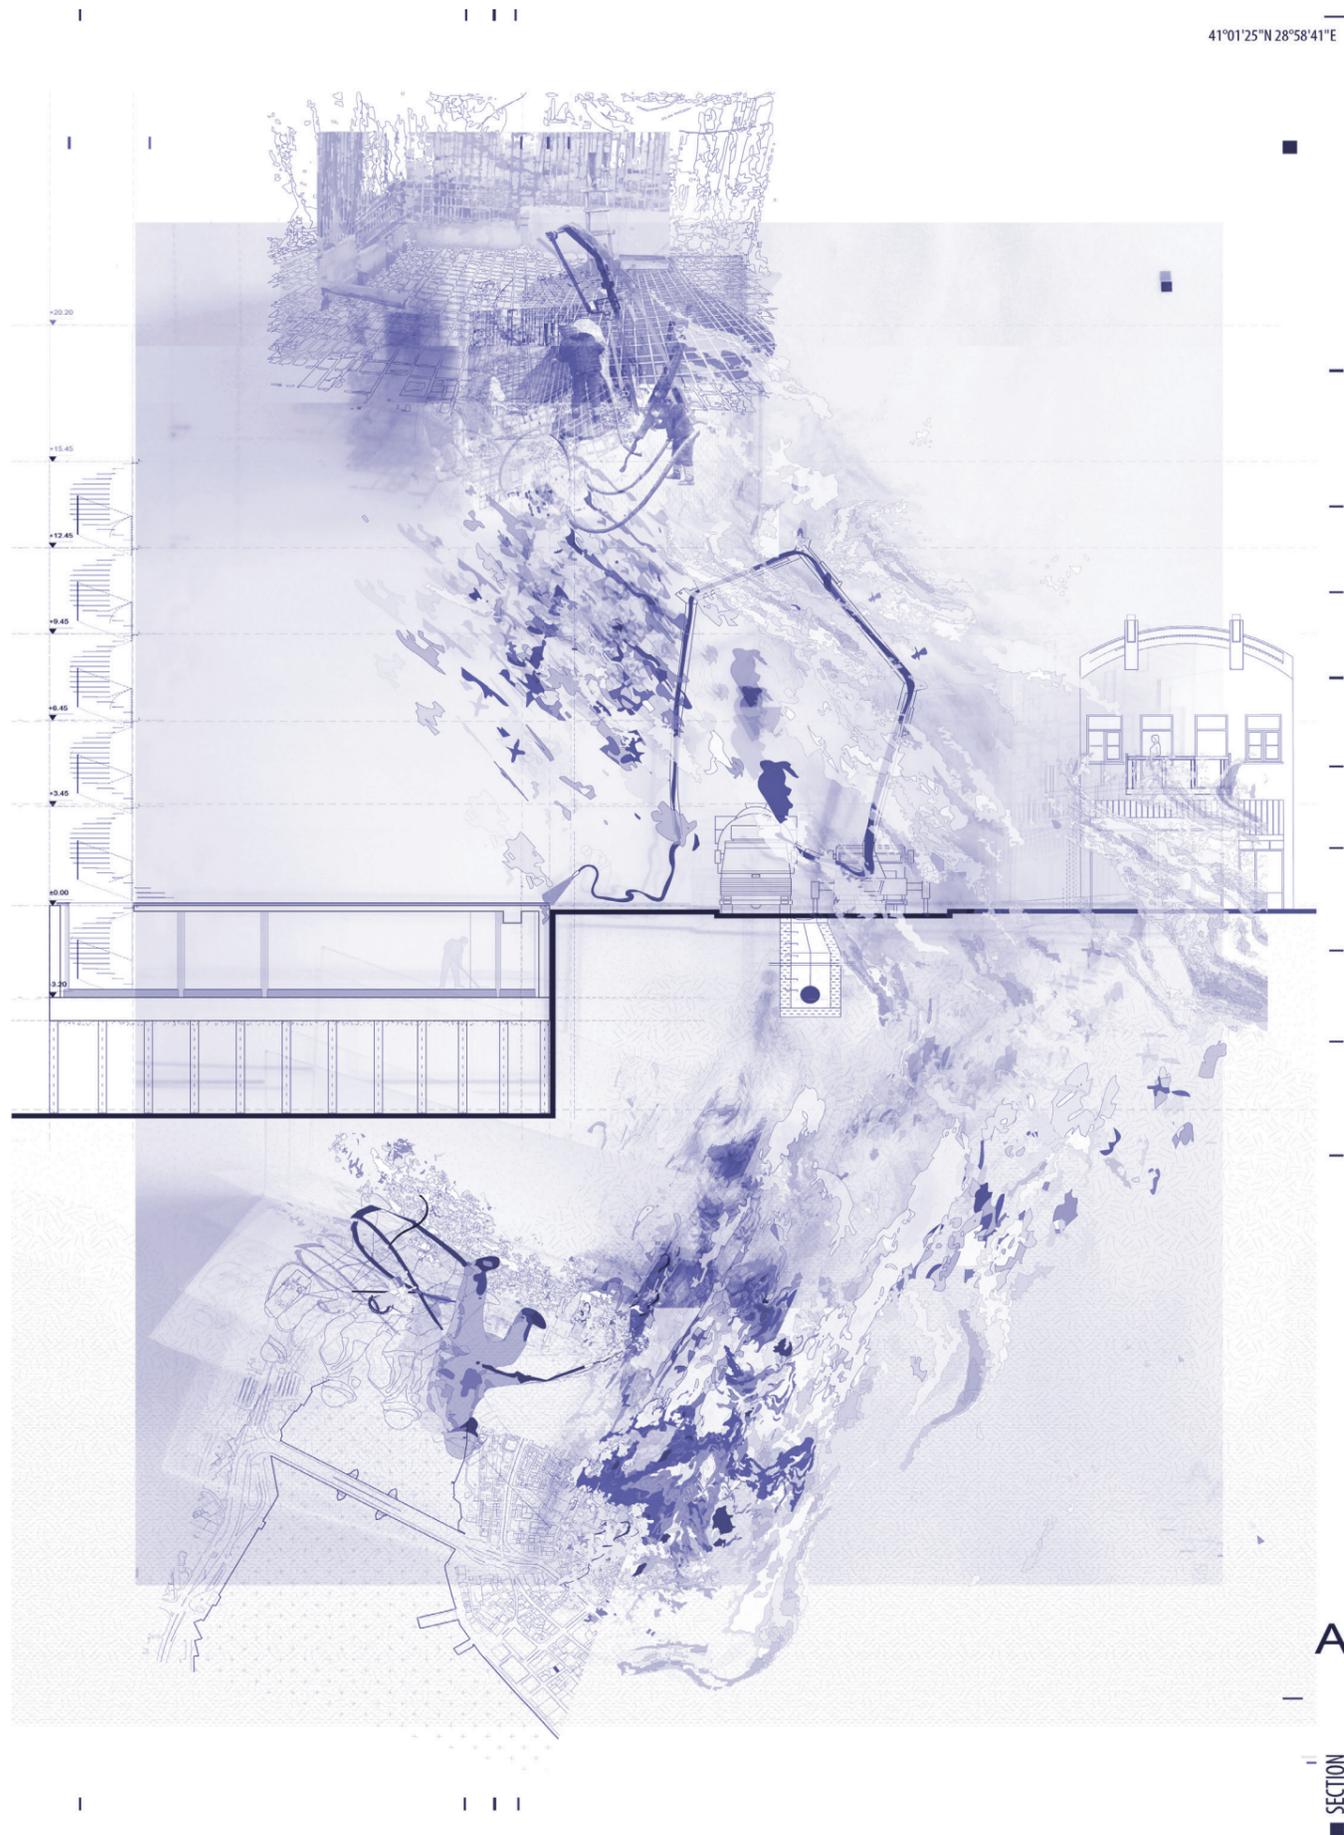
Final Collage, Section A Re-configured: Entanglements of Water, Concrete, and Site. Hybrid collage combining hand drawing, digital drawing, and photo layering. (Author, 2025)
